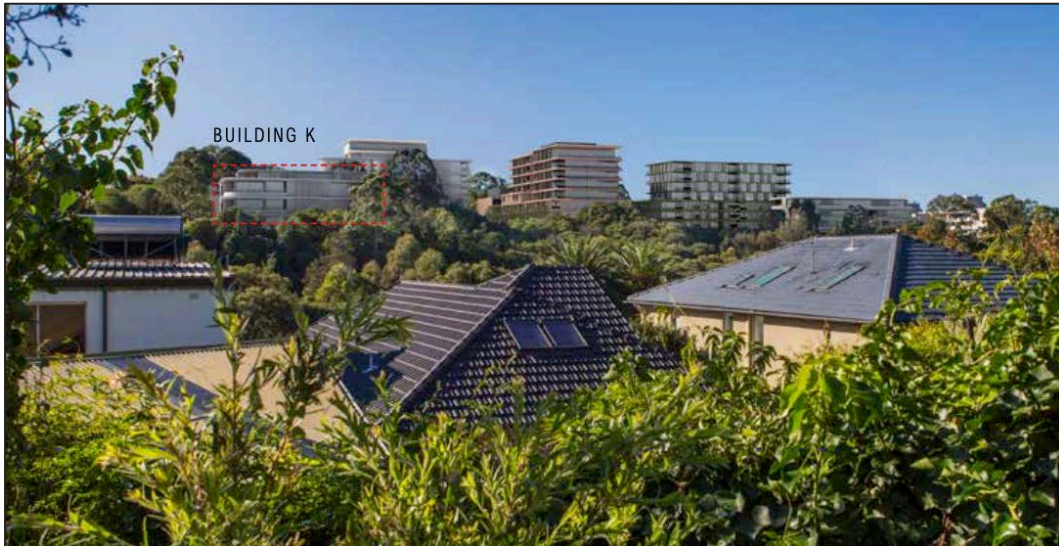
| Artist's impression of the site as viewed from Naremburn (Base image source: CHROFI Architects' Urban Design Report)
